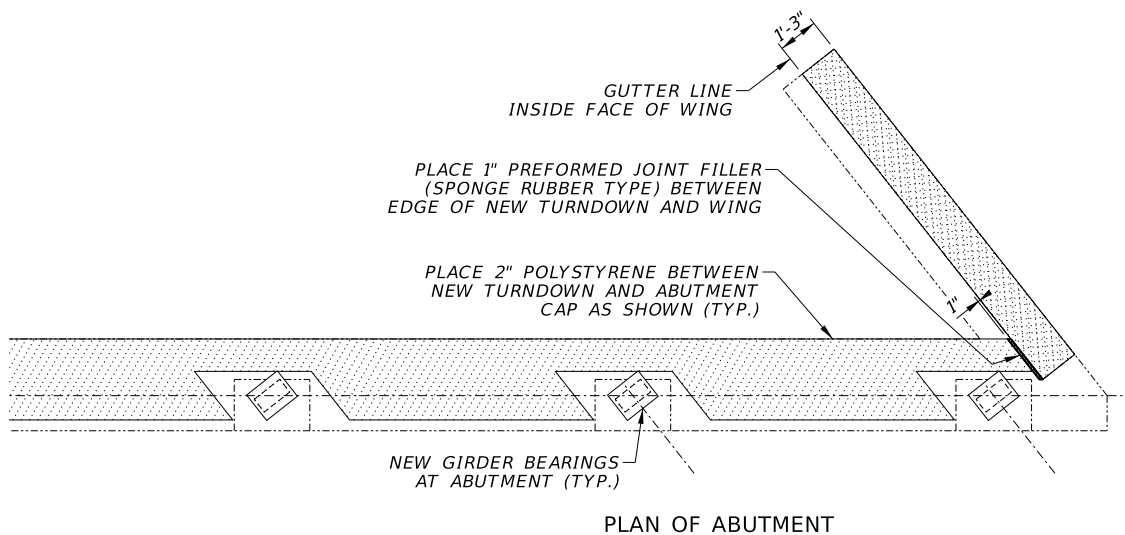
Stepped Grade Beam to Guide Expansion for High Skews without Pedestals at Abutments (example taken from S080 40350, CN 13111, 2016)
